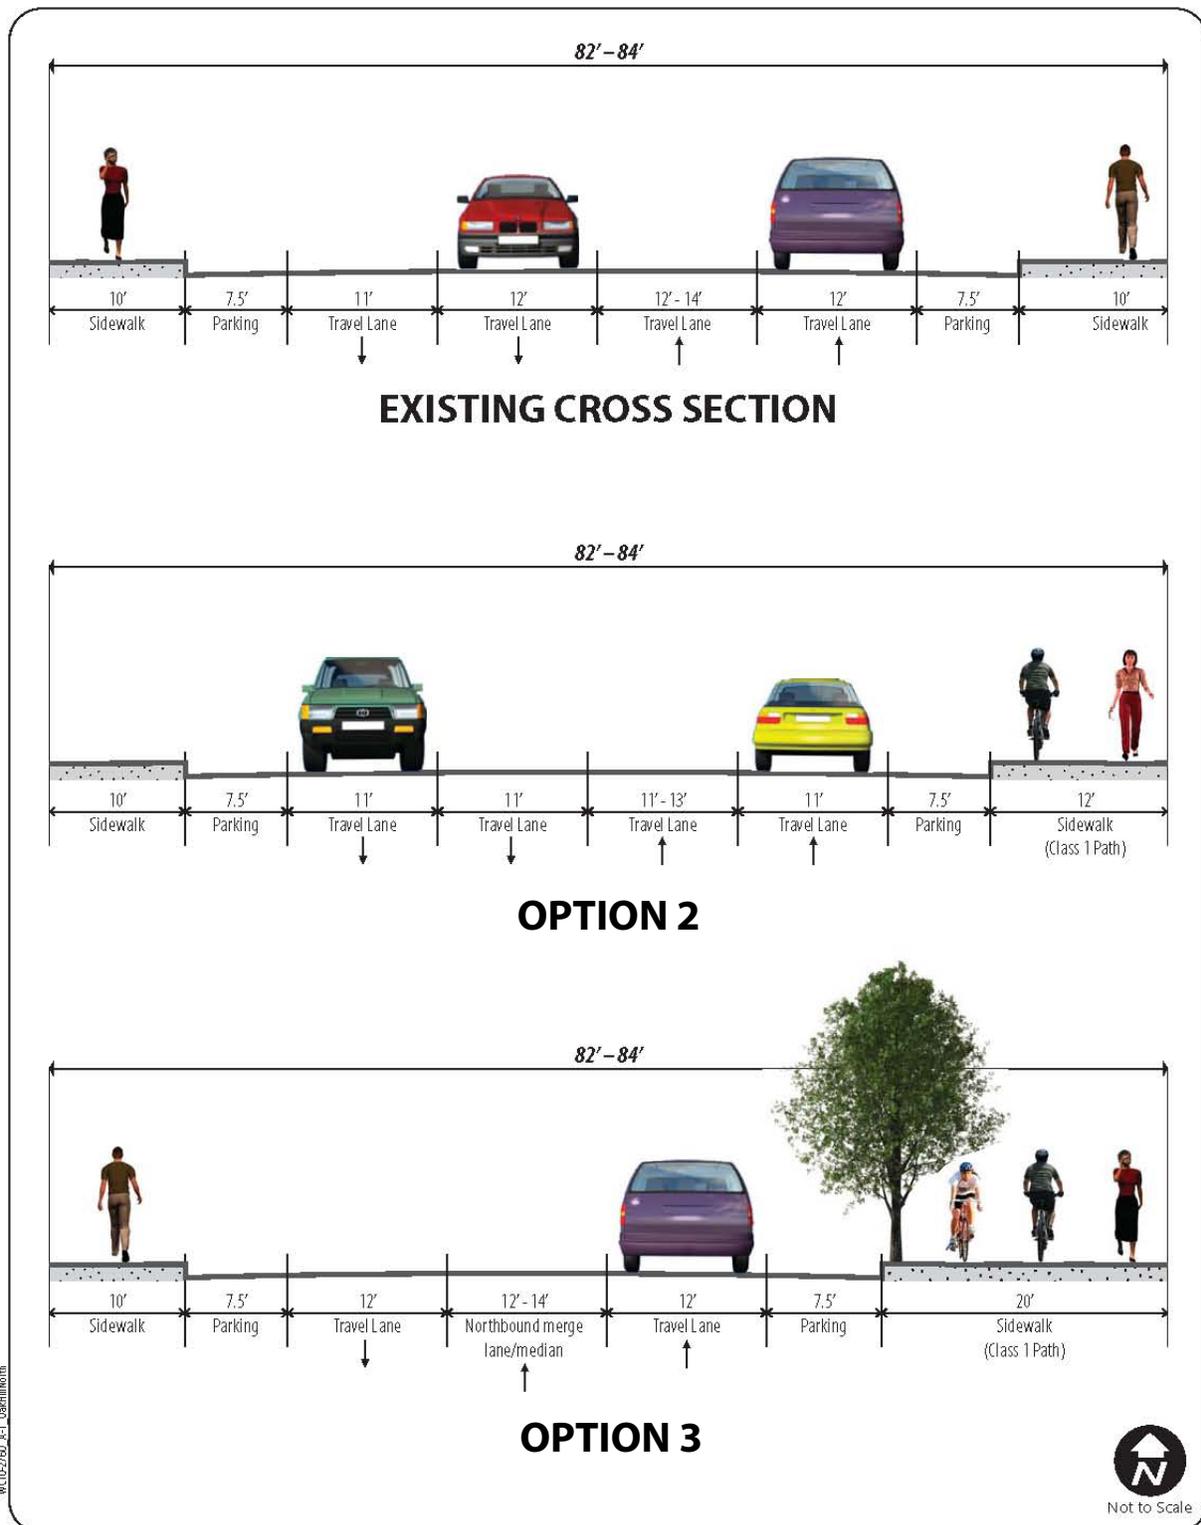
Oak Hill Road North of SR 24: Existing and Proposed Cross Sections
